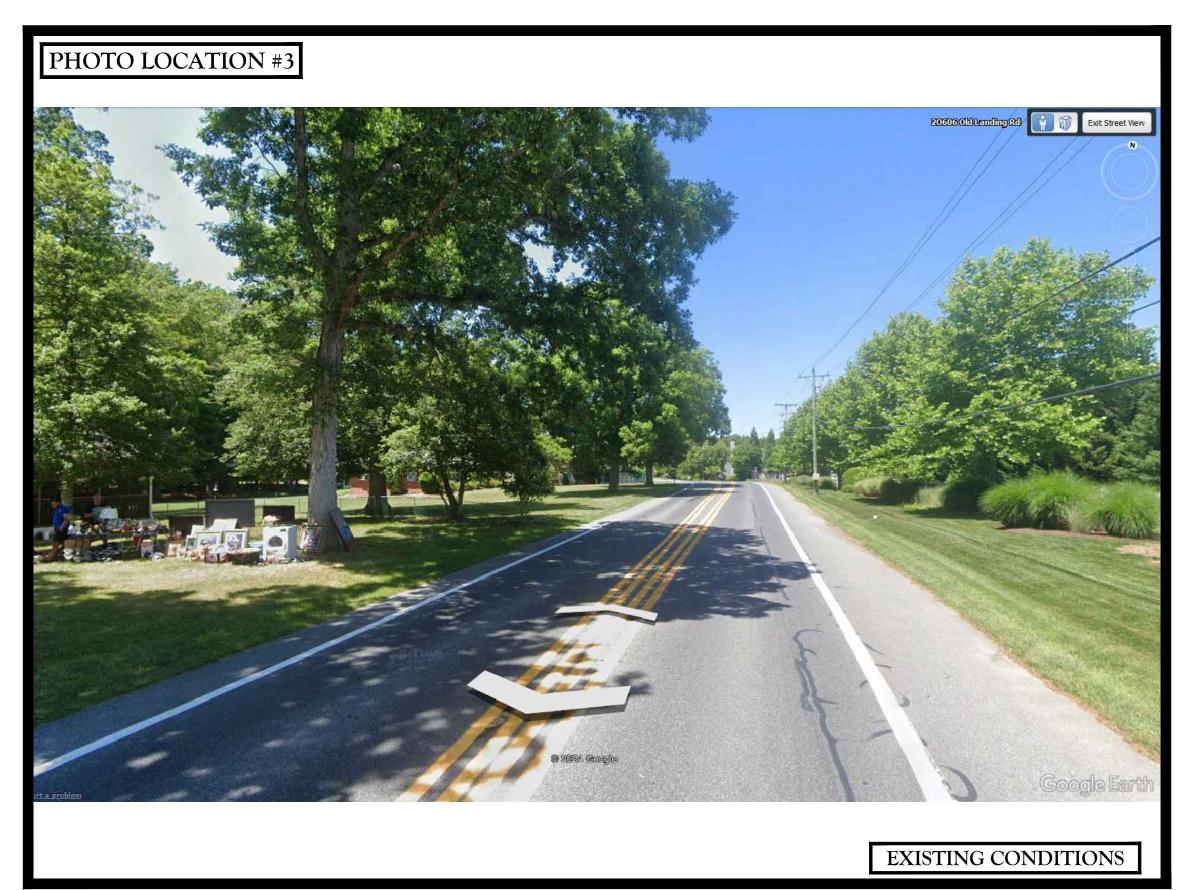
FROM OLD LANDING ROAD LOOKING NORTH TOWARDS SITE
